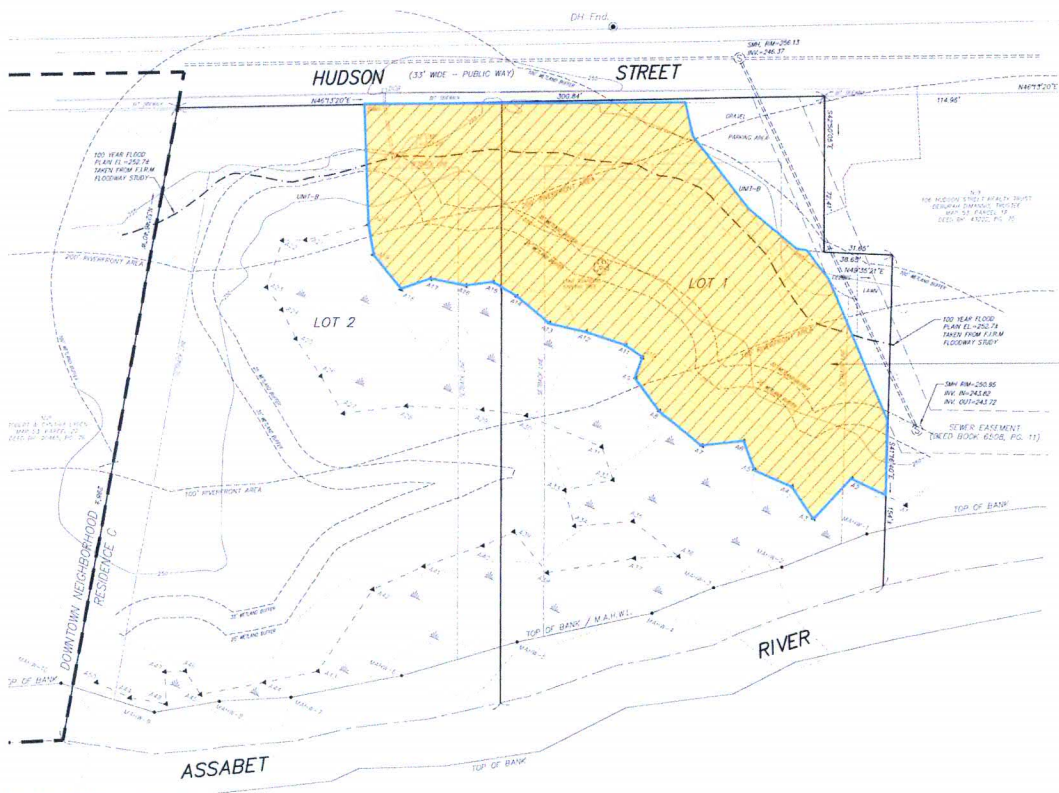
The tan shaded area of the site plan is entirely infested with Japanese knotweed.
